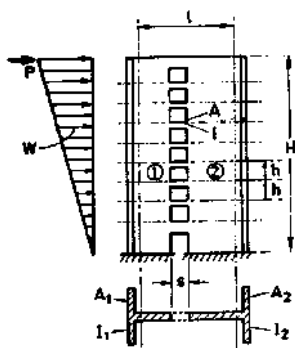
A Typical Coupled Shear Wall Subjected to Lateral Loading
